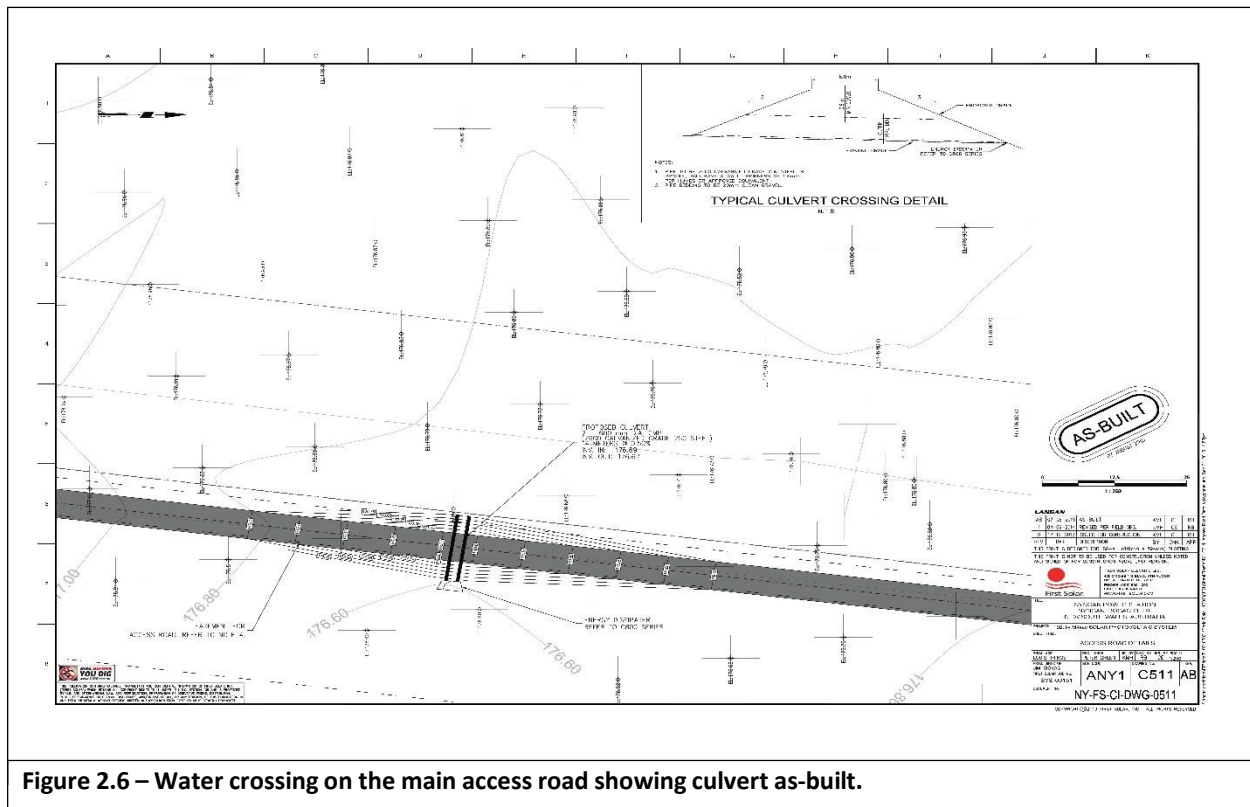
Water crossing on the main access road showing culvert as-built.
